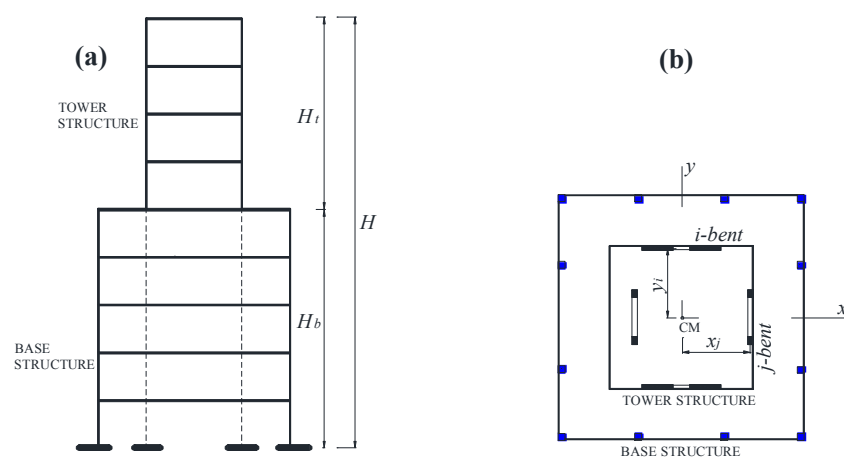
(a) Multistory setback building with (b) an asymmetric structural configuration.
